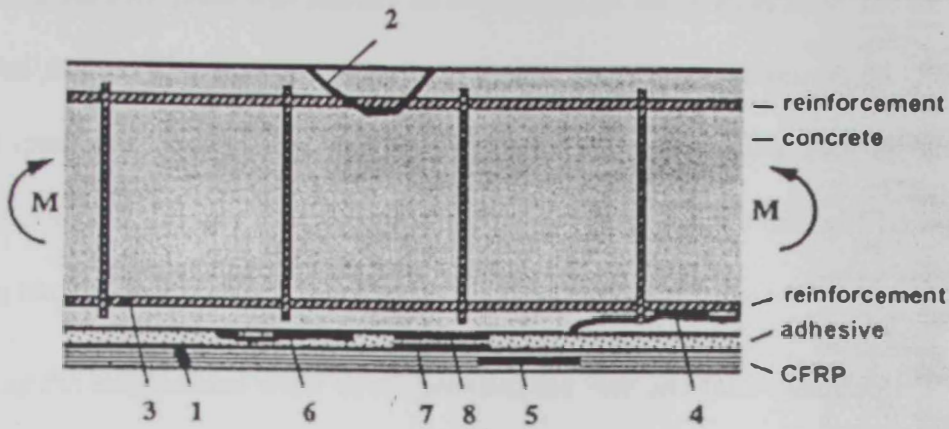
Possible failure modes of a reinforced concrete member strengthened by FRP
